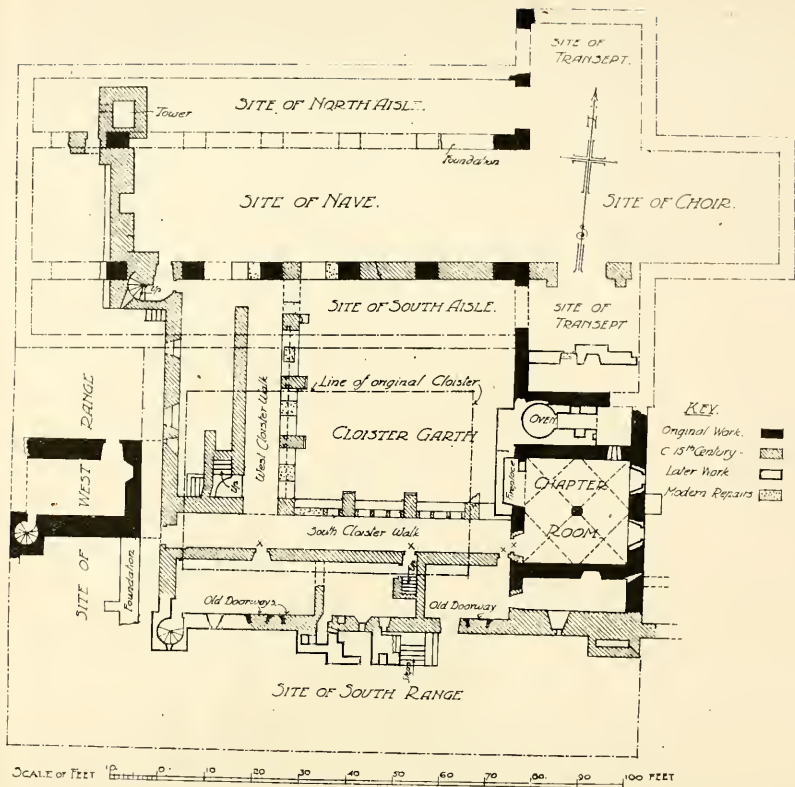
GROUND FLOOR PLAN, BECTIVE ABBEY
